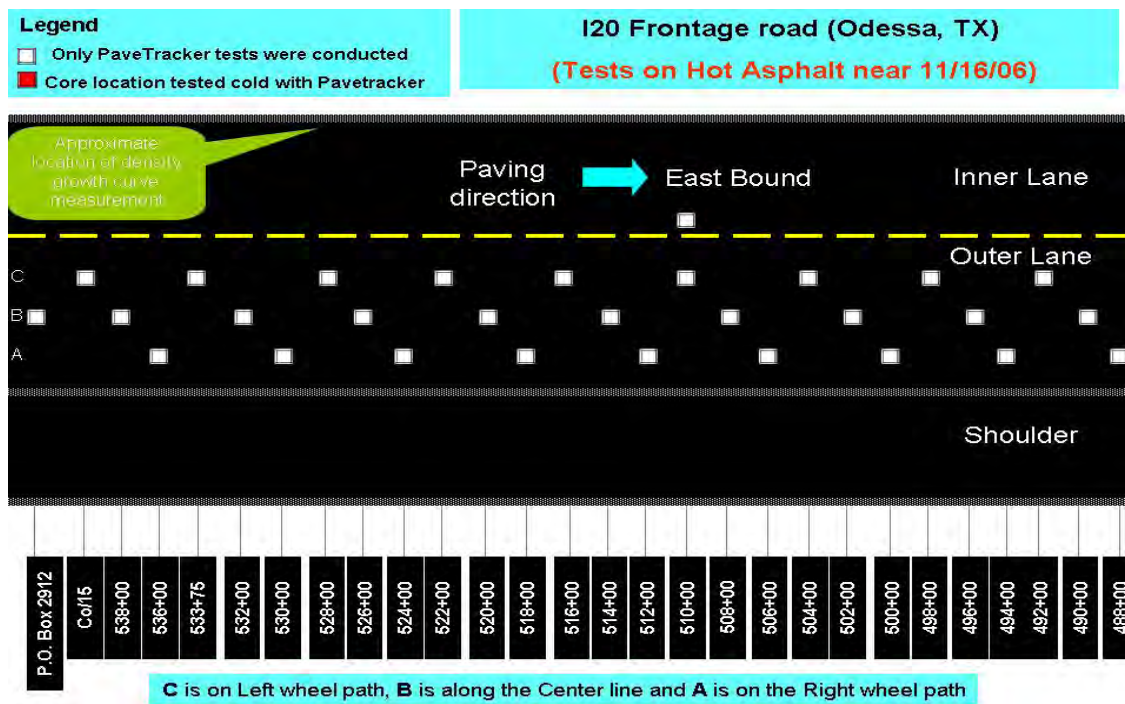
Test Point Layout of Section 2 for HMA Testing Along the I-20 Frontage Road in Odessa, Texas
